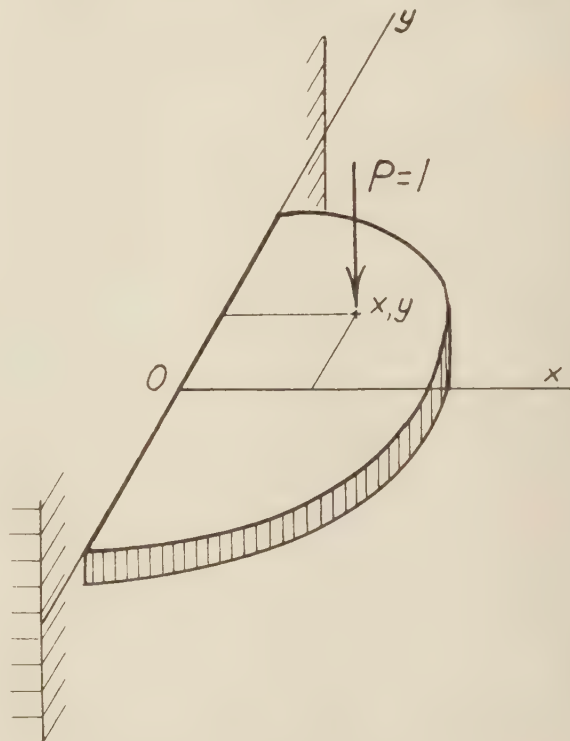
LARGE SLAB CANTILEVERED FROM A RIGID WALL
